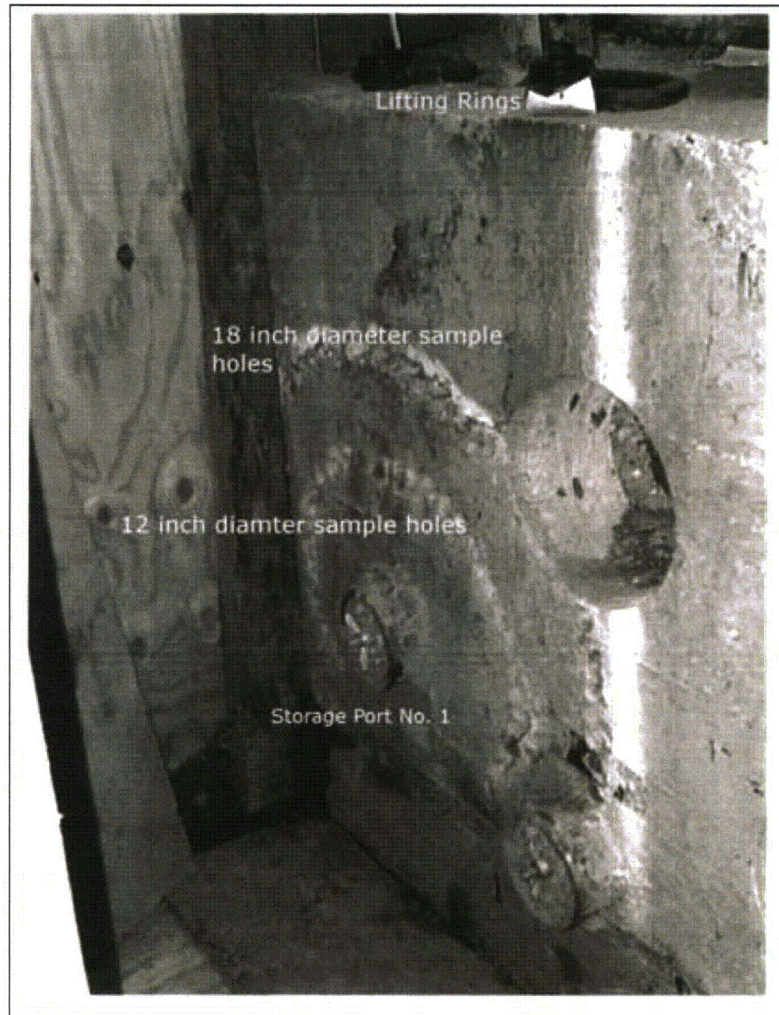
, Concrete sampling around Storage Port 1 to check for activation products
